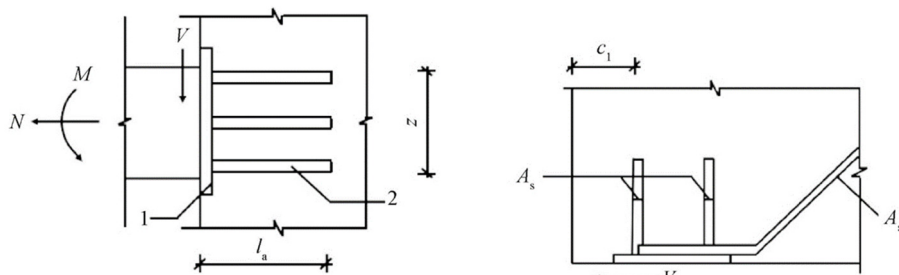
Embedded Fitting with Combined Bent and Straight Anchors Resisting Shear
